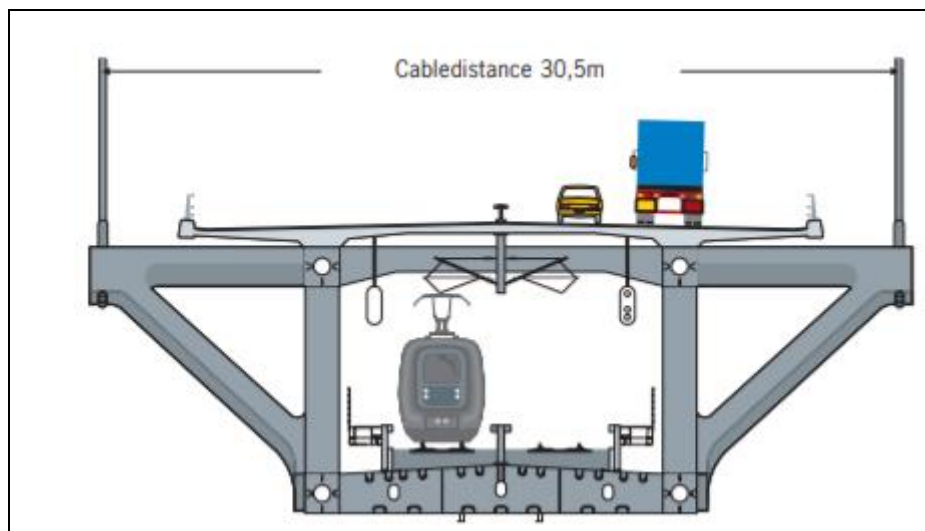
Example of Cross section for a bridge shared by road and railway [24]
